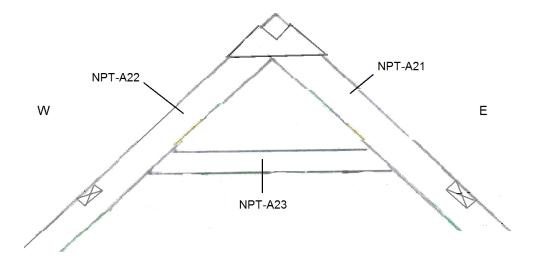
Sketch of truss 8, showing the location of samples NPT-A21-3
